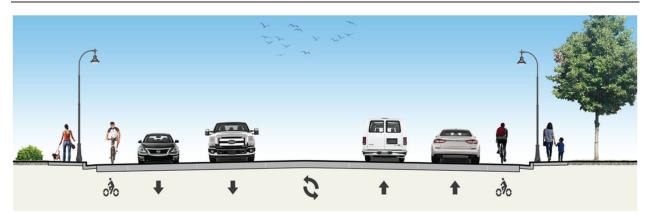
Preferred Alternative for North Stewart Street to North Roop Street
